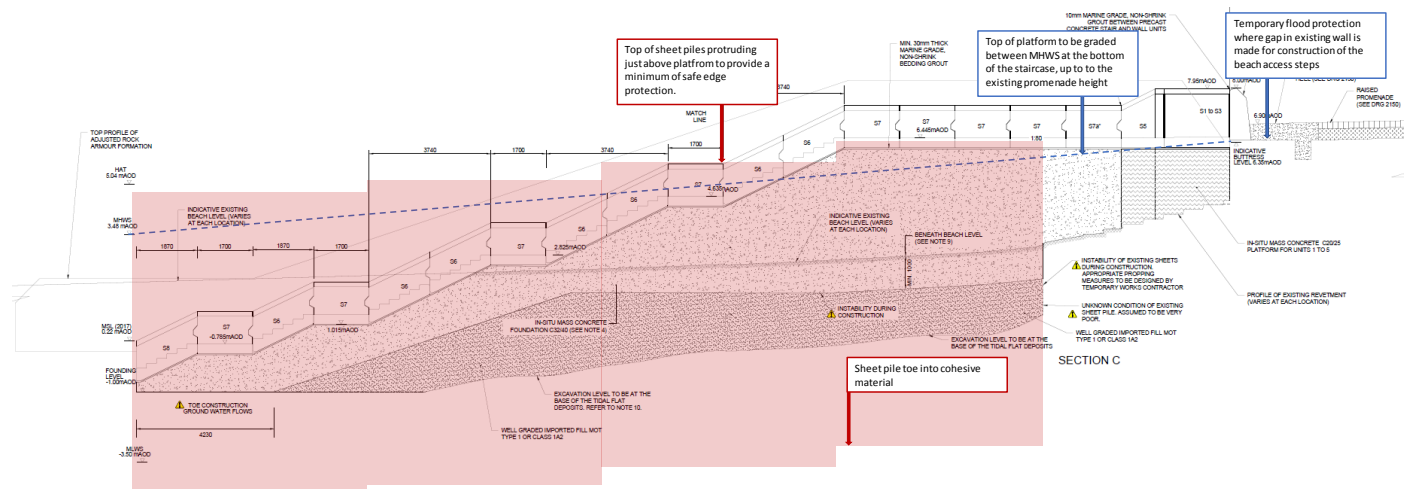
Profile of sheet piles and working platform (see appendix 7 for clarity)
